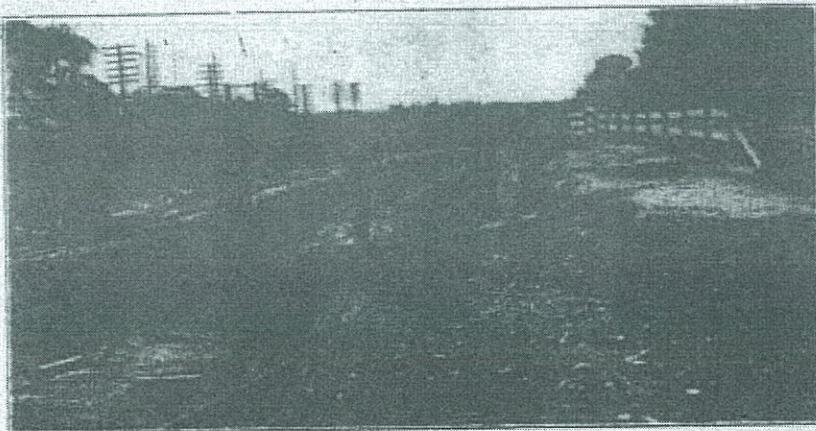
Looking West at Dowling Avenue, June 18, 1911.
